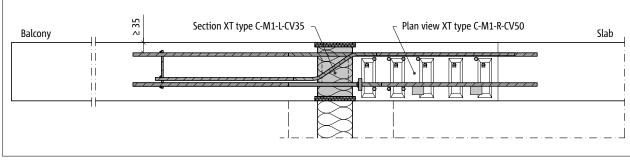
Schöck Isokorb® XT type C: Outer corner with non-load-bearing cavity wall masonry (section XT type C-L-CV35; view XT type C-R-CV50)
